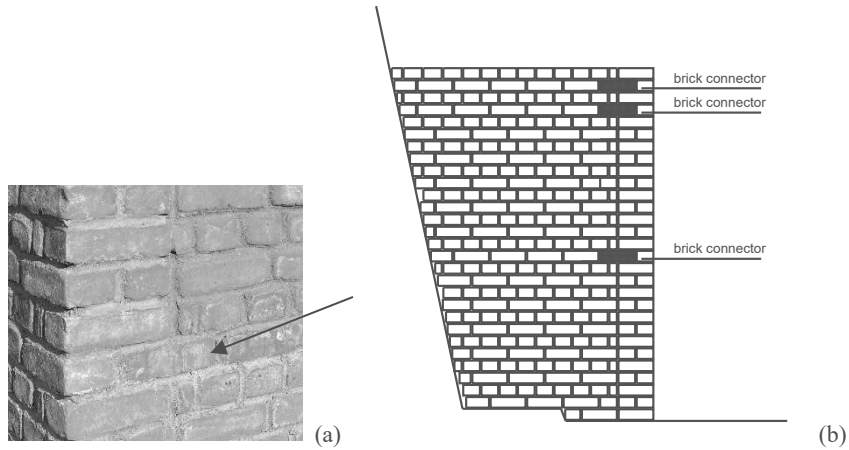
(a) Detail of brick used as wall-to-wall connector, (b) location of the brick connectors.
